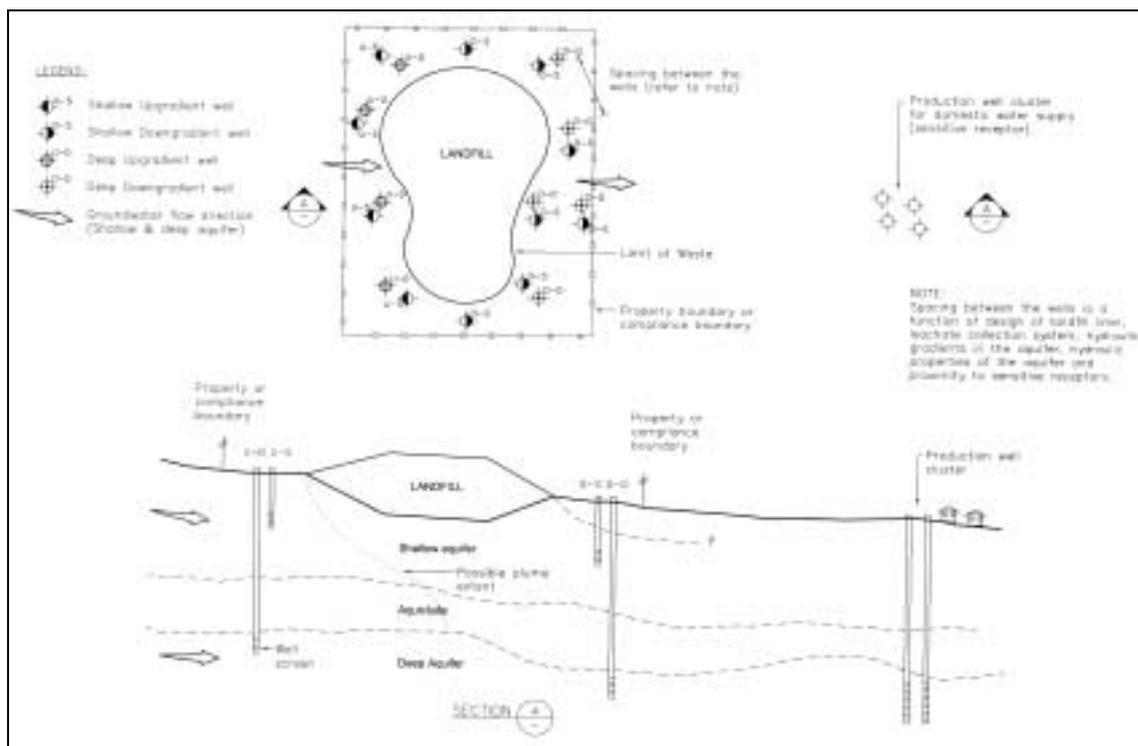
Groundwater monitoring well layout for sample landfill site
